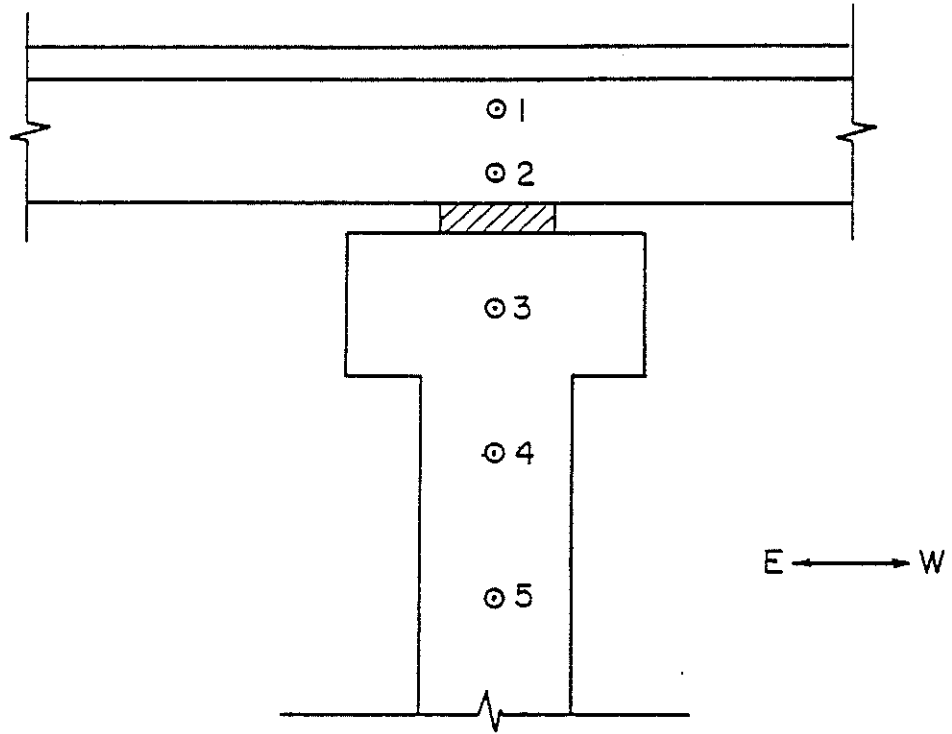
Marker Placement on a Typical Bent Supporting a Continuous Joint.
